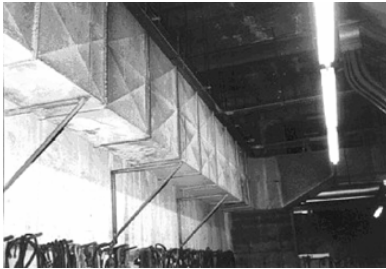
Glendale Power Plant, 1971 San Fernando Earthquake. Cantilever Bracket Supported Rectangular Duct
